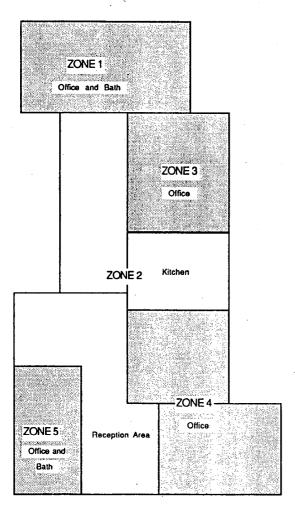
a General Floor Plan of the Prototype Converted Office Building (Ground Floor)
